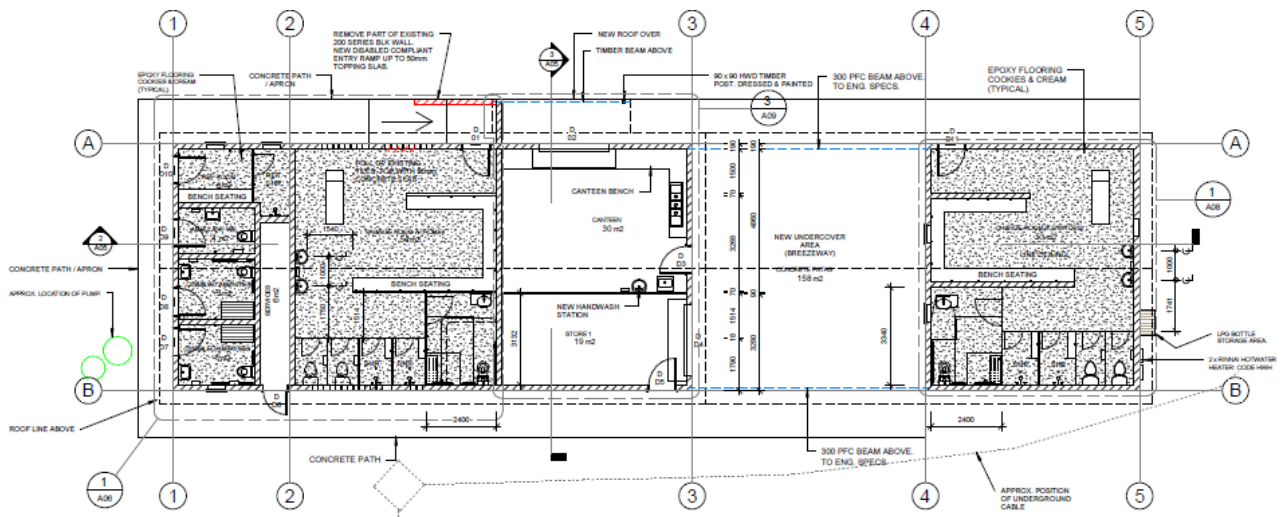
Floor Plan Option 1: Accessibility facilities to new and existing change rooms
